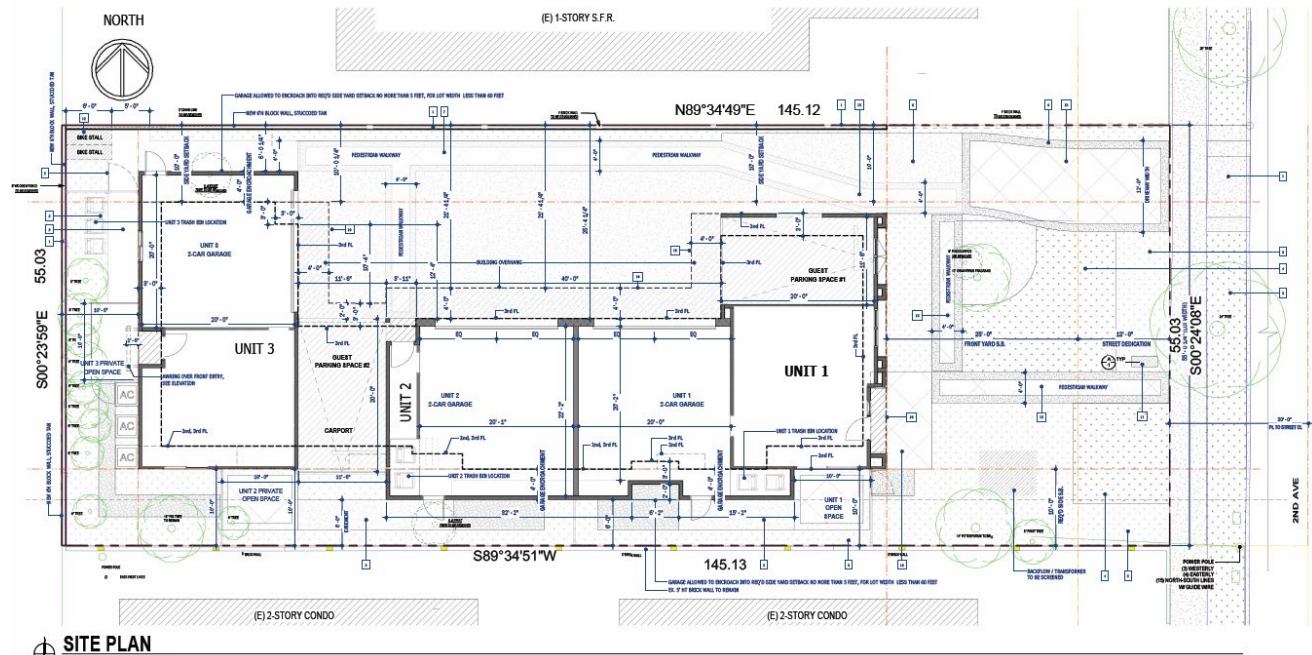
Approved Site Plan for 709 S. 2nd Avenue
